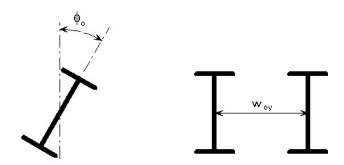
Twist imperfections ϕ_0 and flexural imperfection W_{0y} .
